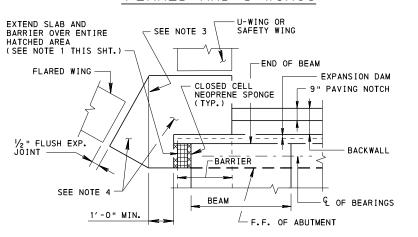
DETAIL FOR SKEWED ABUTMENT WITHOUT BACKWALL FLARED AND U-WINGS
